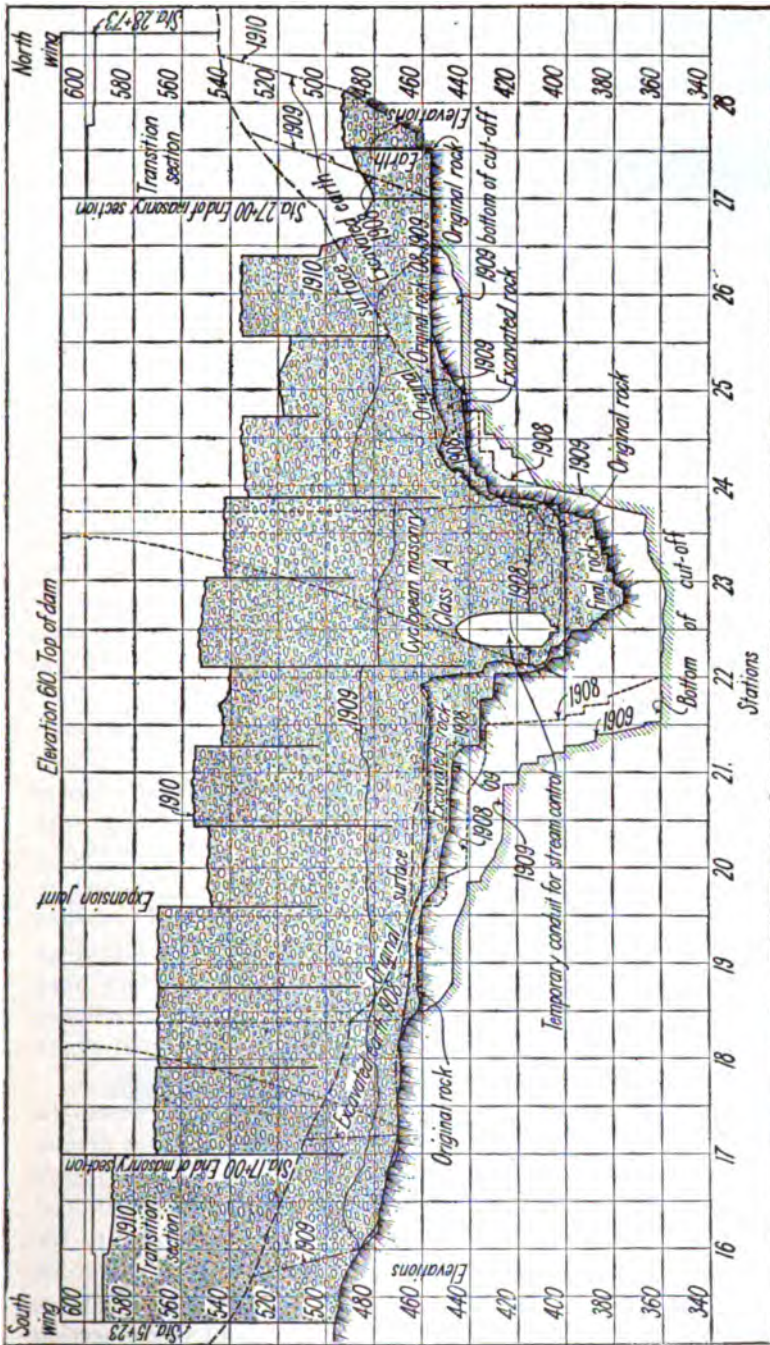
Olive Bridge Dam. Maximum Longitudinal Section, Showing Progress in Placing Masonry during 1908, 1909, and 1910. Unshaded Portion was Finished in 1911.
